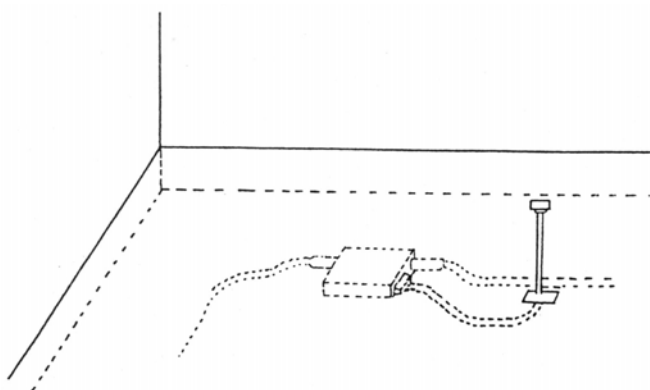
Transceiver and Transceiver Cable Above-the-ceiling Mounting and Under-the-floor Mounting Example
